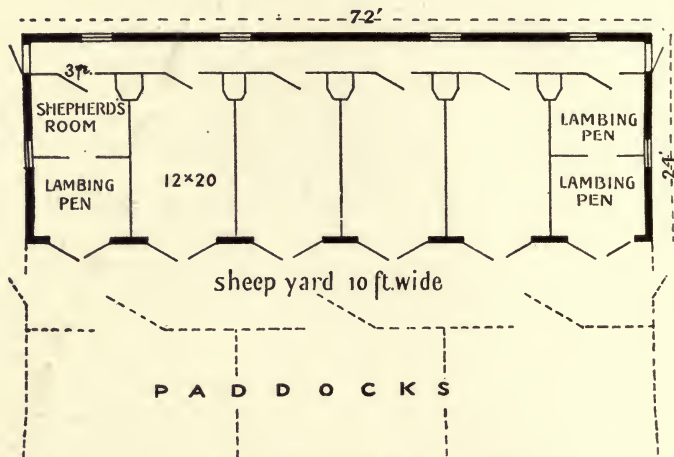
GROUND PLAN OF SHEEP BARN FOR AN ORDINARY FARM FLOCK
